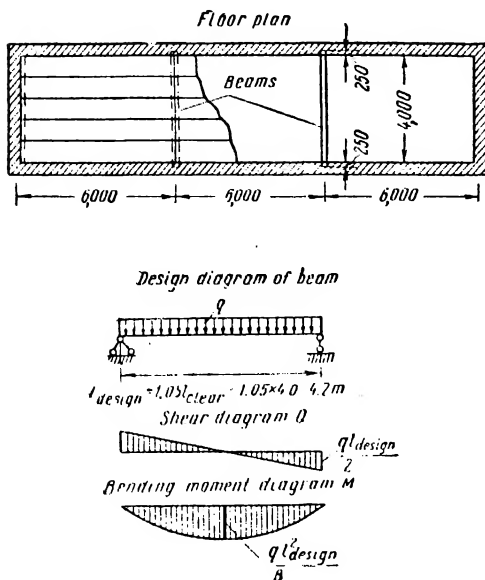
Illustrating problem 10: floor plan, and structural and moment diagrams;  $l_{\text{clear}}=4\text{ m}$
